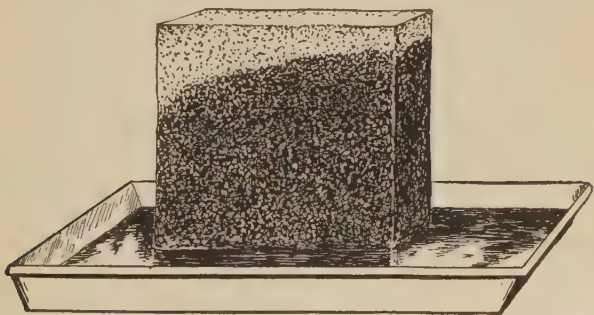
,264.—Experiment showing that concrete is porous. A concrete wall will absorb moisture exactly as this concrete block has absorbed water, as indicated by the darkened section.
